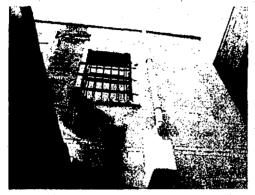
is a typical view of an outside mounted exhaust fan and discharge pipe for system 4B on Building #4.
